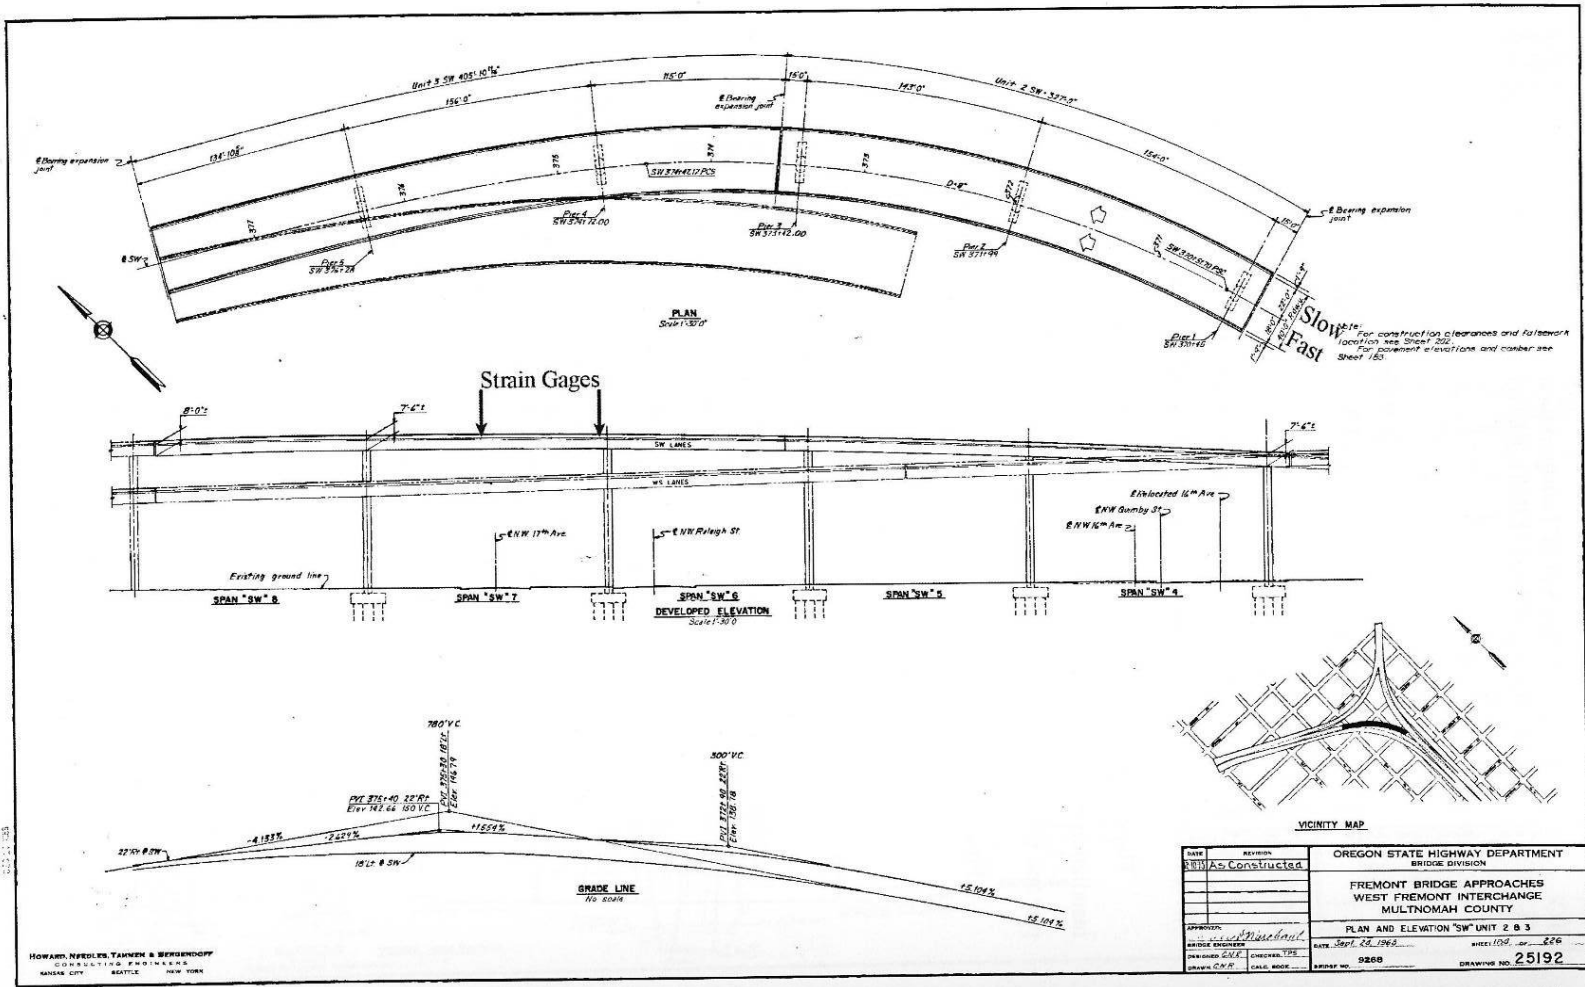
Instrumented sections for Bridge superstructure 09268A (SW line).
